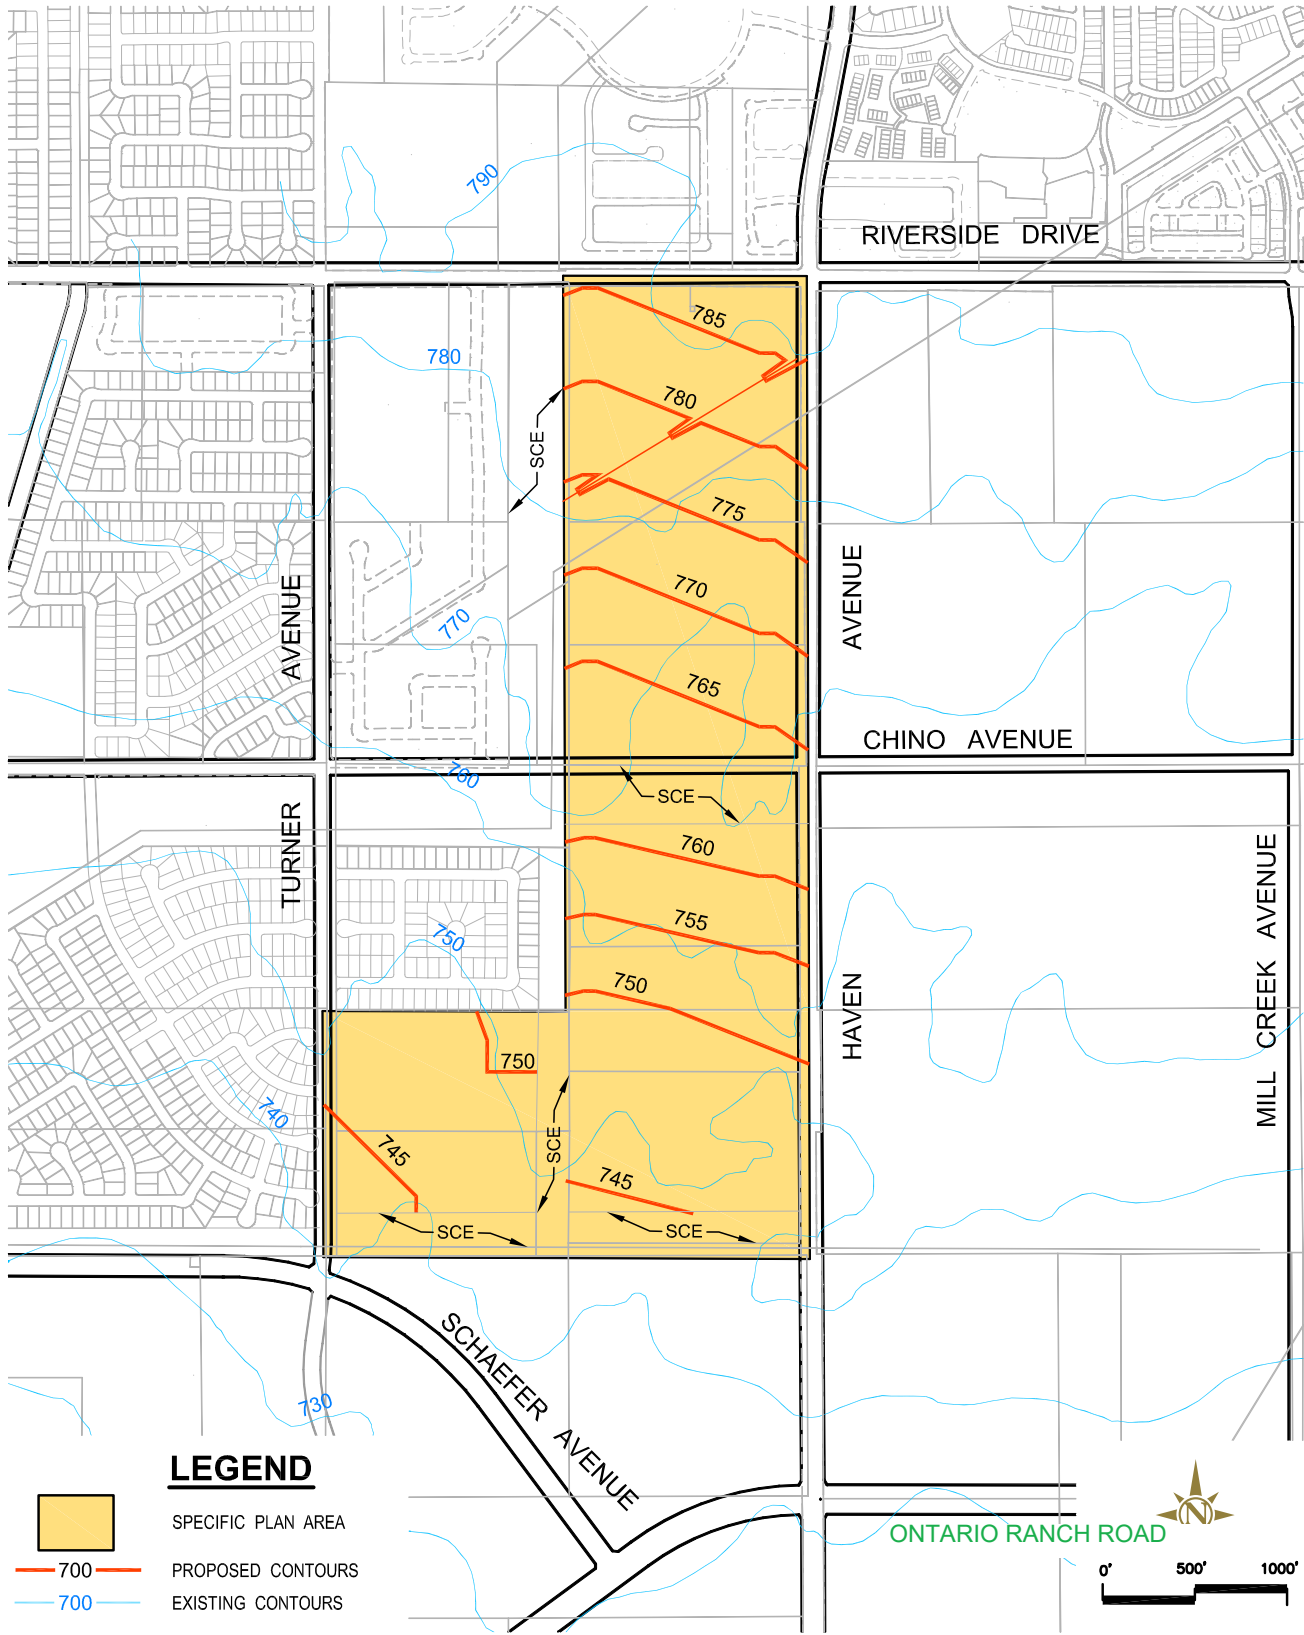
CONCEPTUAL Grading Plan
